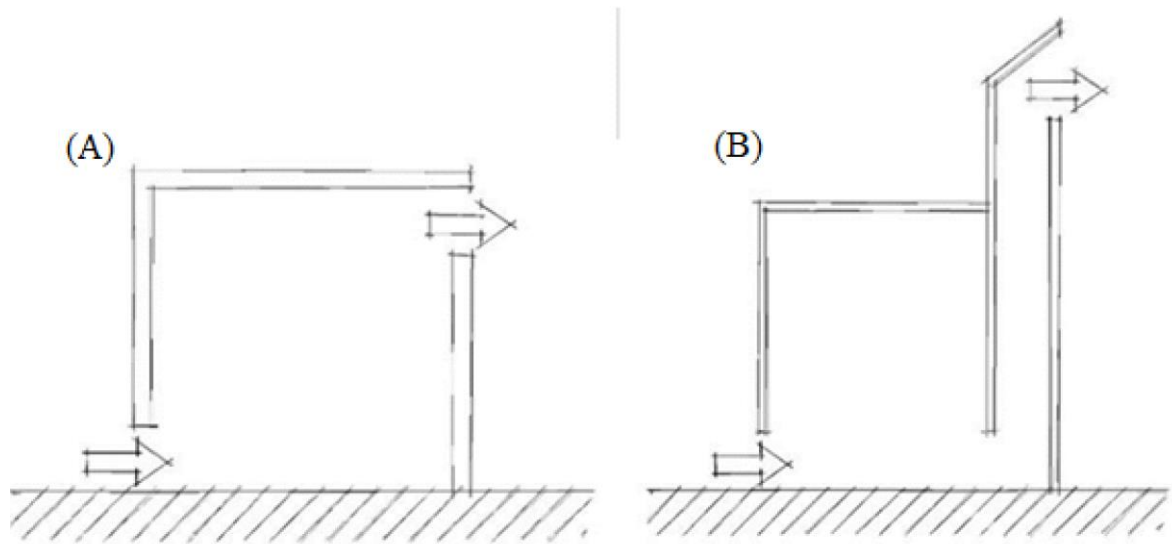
Stack ventilation in a space with openings (A) and stack ventilation with the use of ventilation chimney (B). Source: (Omrani, 2018)
